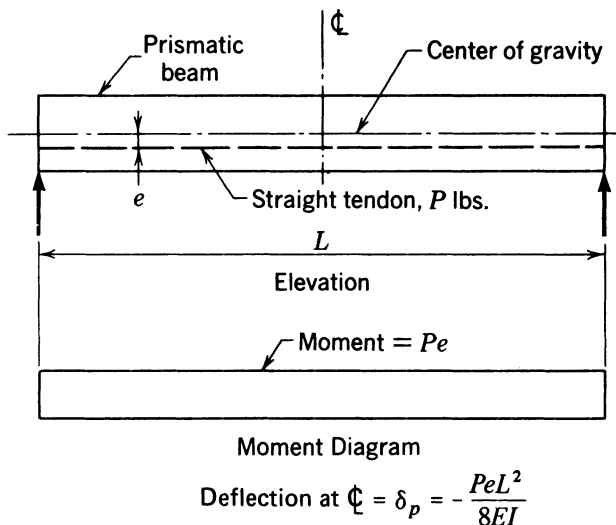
Layout and prestressing-moment diagram for a beam having a straight tendon.
